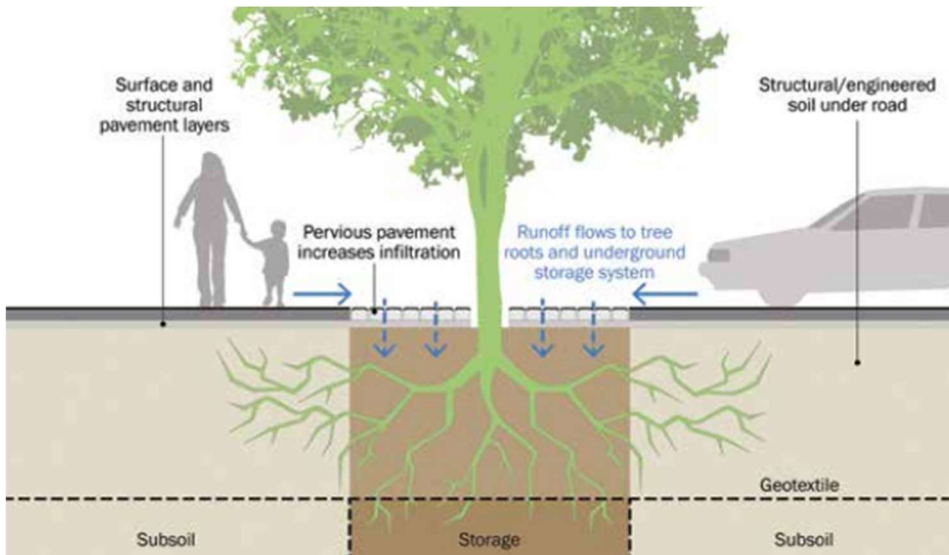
Typical Tree Pit Detail (CIRIA SuDS Manual C753)
